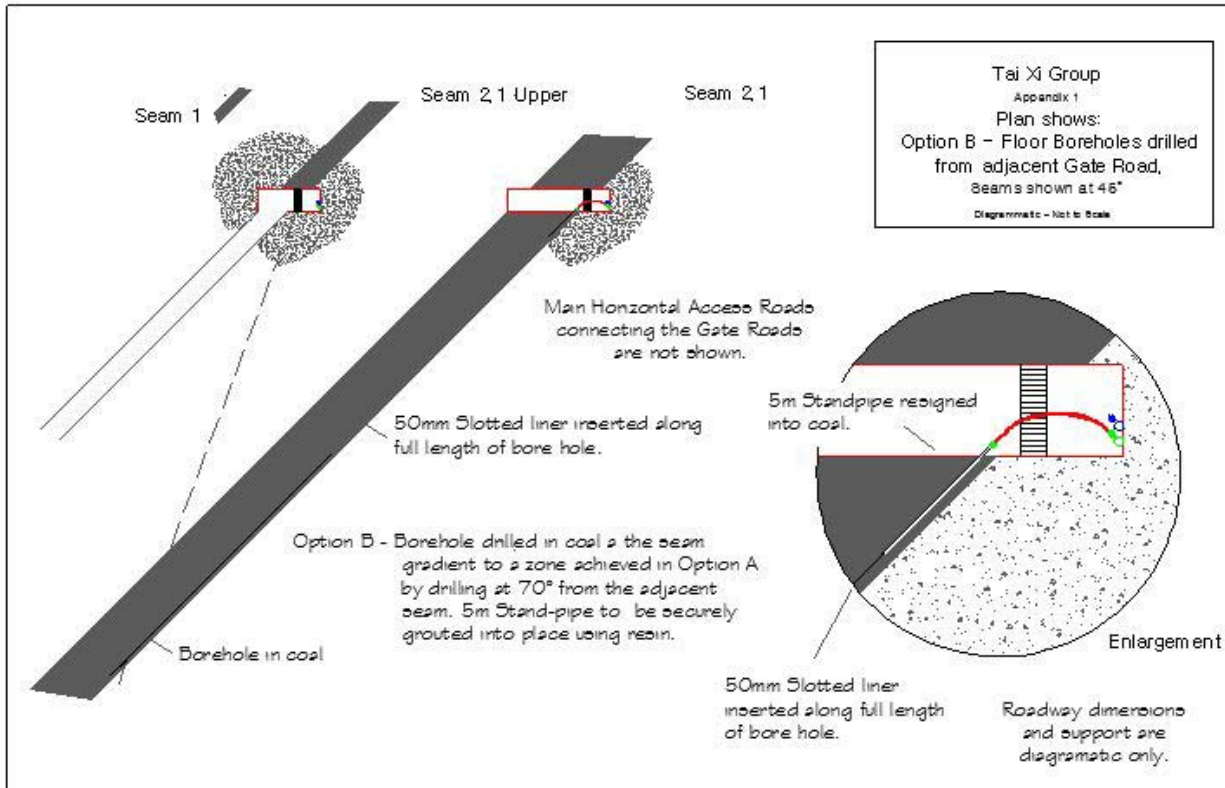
Drawing Showing Floorhole Design Drilled from Third Gate Development Road
